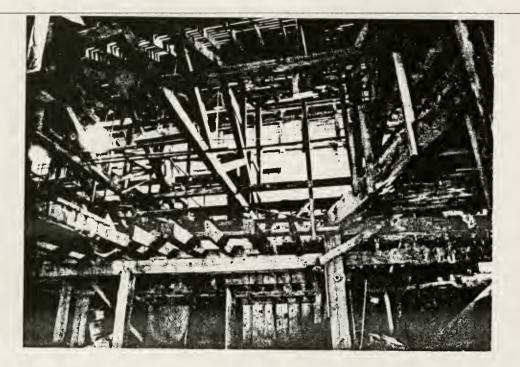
Revenue Mill (structure #34) interior flotation level showing trusses above, looking east.
